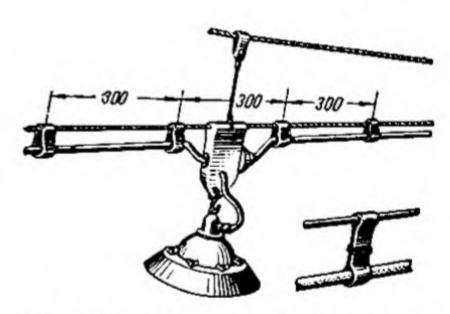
Messenger cable installation wired with CPF (SRG) or BPF (VRG) cables.
